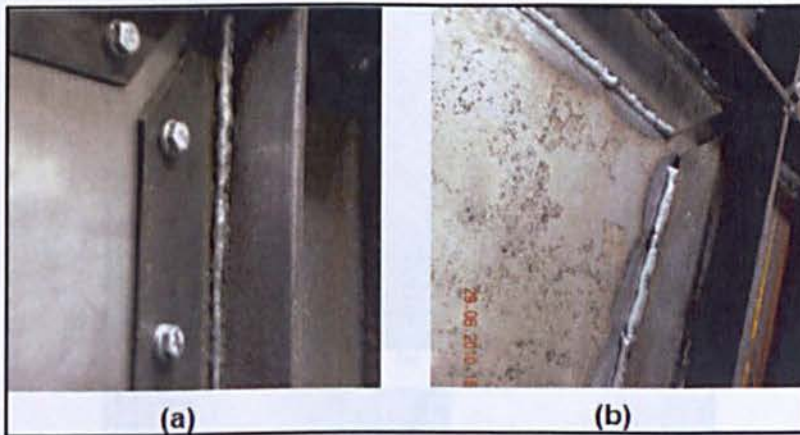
Connection of steel plates to fish plates (a) Using HSFG bolts for 0.675 mm thick steel plate and (b) Using MIG weld for 1.4 mm thick steel plates
